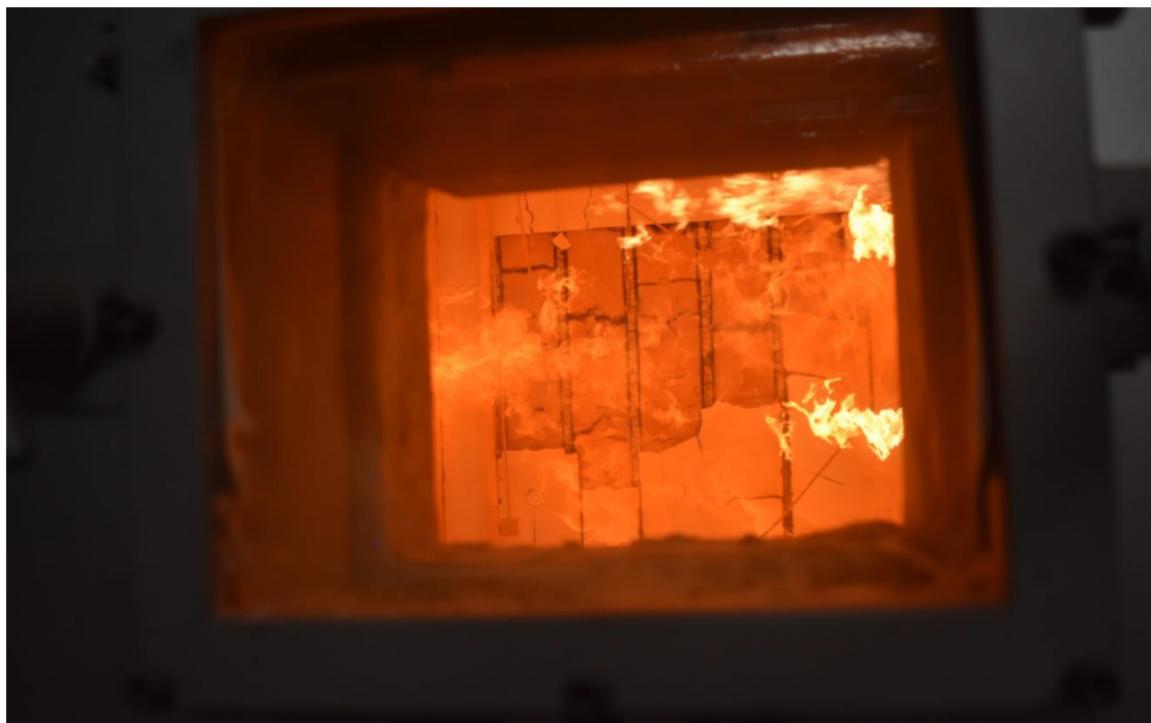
Most of the gypsum boards fallen off from the exposed side.
